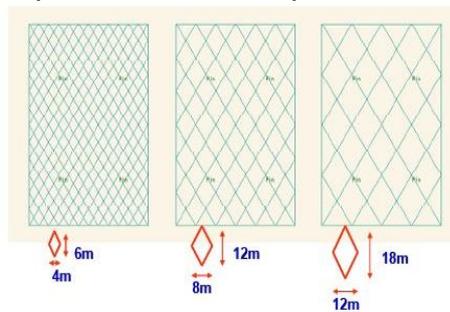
Structural Truss Grid Dimension Options Figure 4: Chosen Structural Truss Grid
